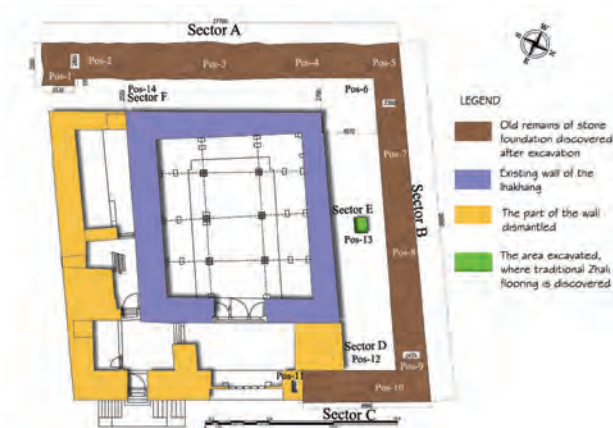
Plan showing existing walls, walls dismantled and old remains of stone foundation
